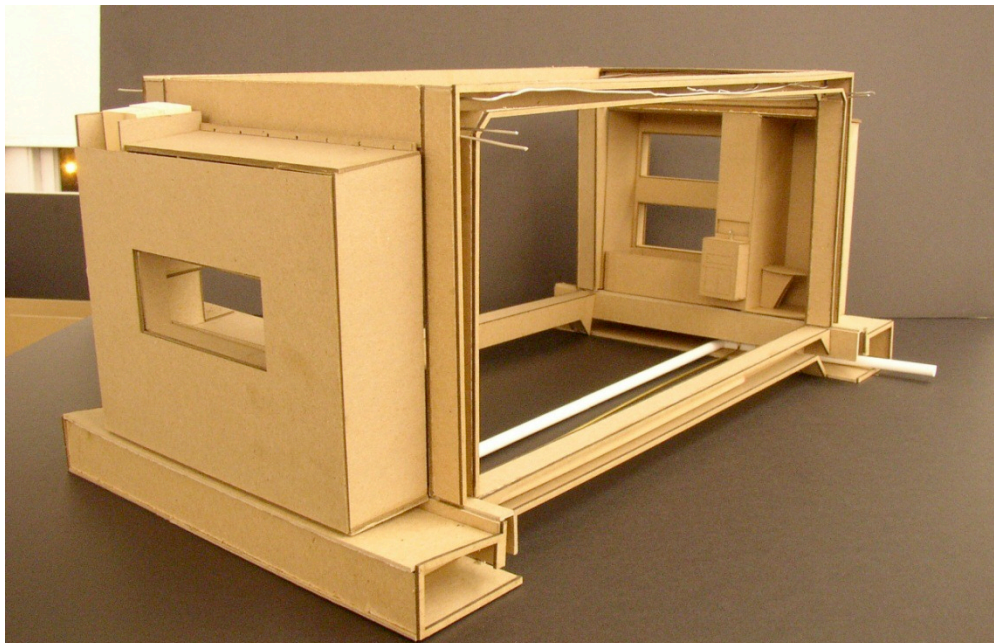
Early study model of organizing the kitchen and bathroom on opposite sides of the unit. The project was developed so that the plumbing, electrical, and HVAC services would run through the building frame. (Luke Hellkamp, 2007)
